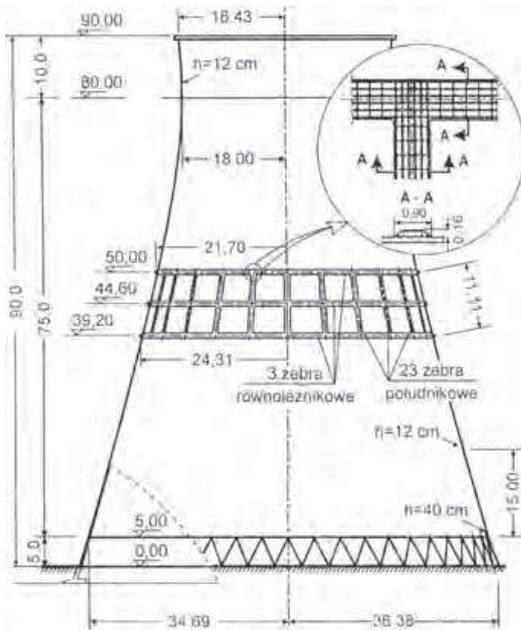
The strengthening of the cooling tower shell by reinforced concrete ribs - the first variant [9]
